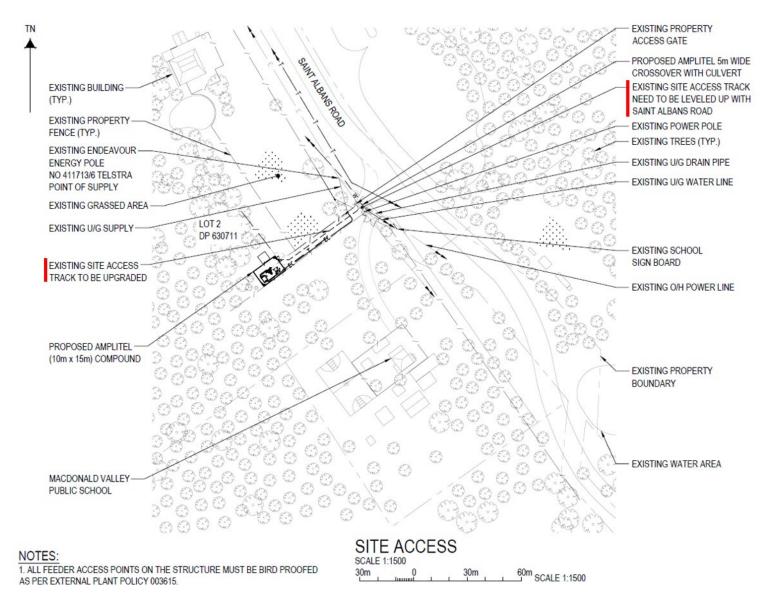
Site Access Plan (source: DWG No. NSW100010 Issue 1 dd 03/08/23, Sheet S1)
